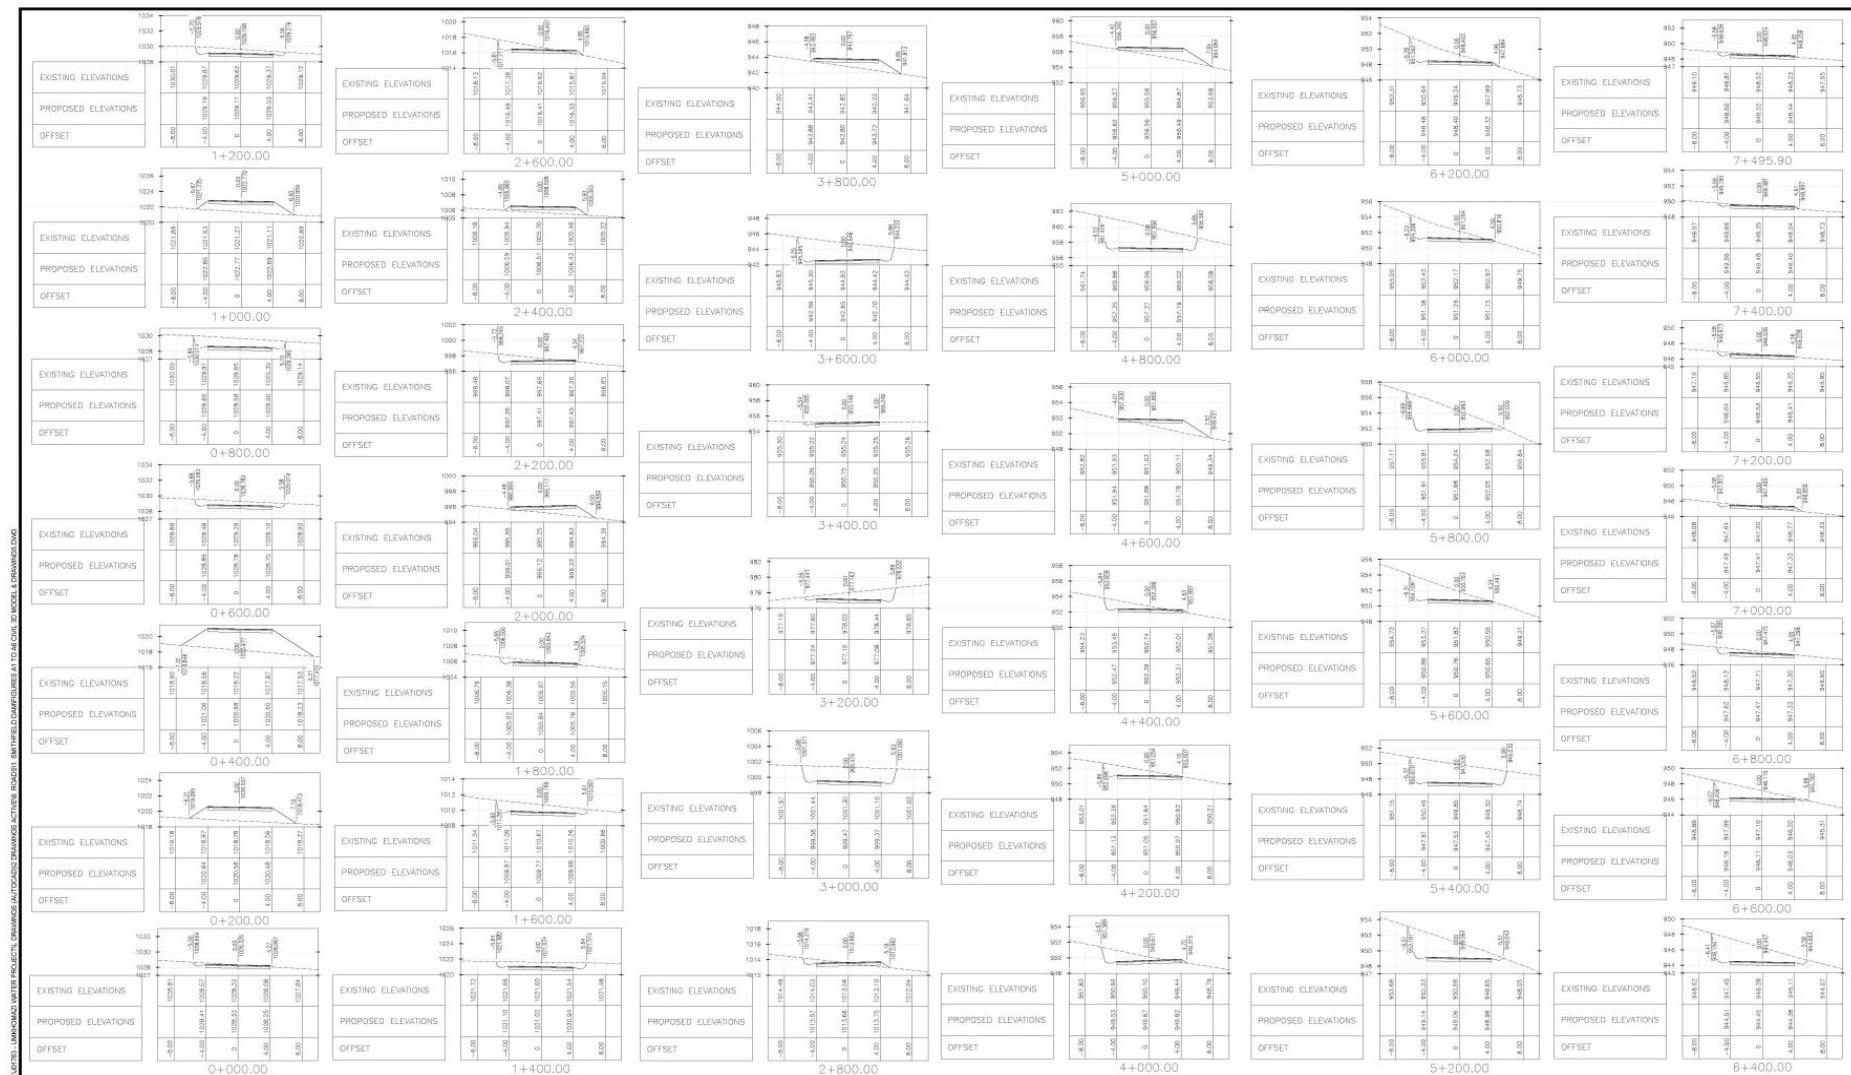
C.5: Smithfield Dam – Cross sections of main access road
